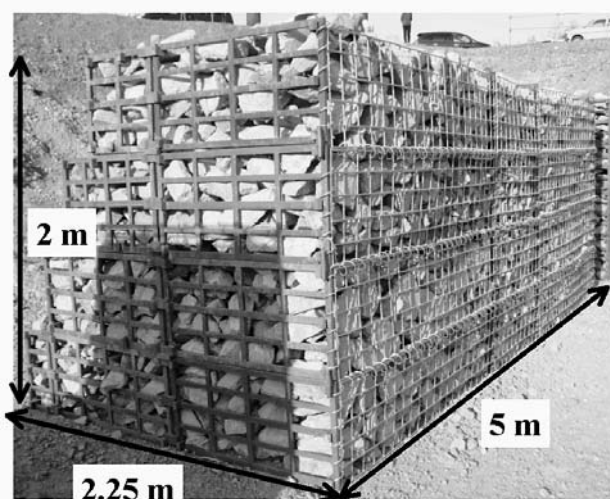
Hybrid wall combining wire mesh panel and ductile cast iron panel
